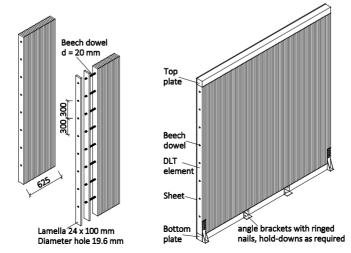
Left: DLT element. Right: DLT shear wall.
